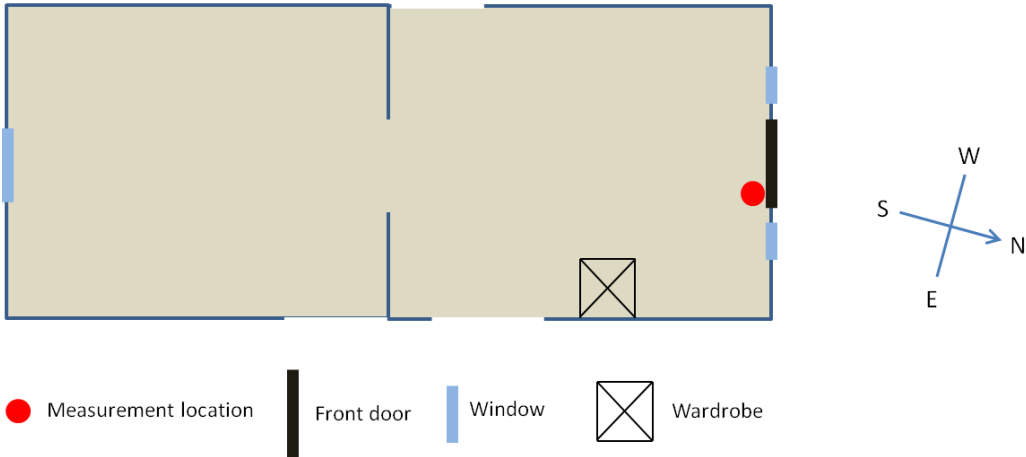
Layout of the room with front door 2 and layout of connecting room showing that the door is in parallel with a window.
